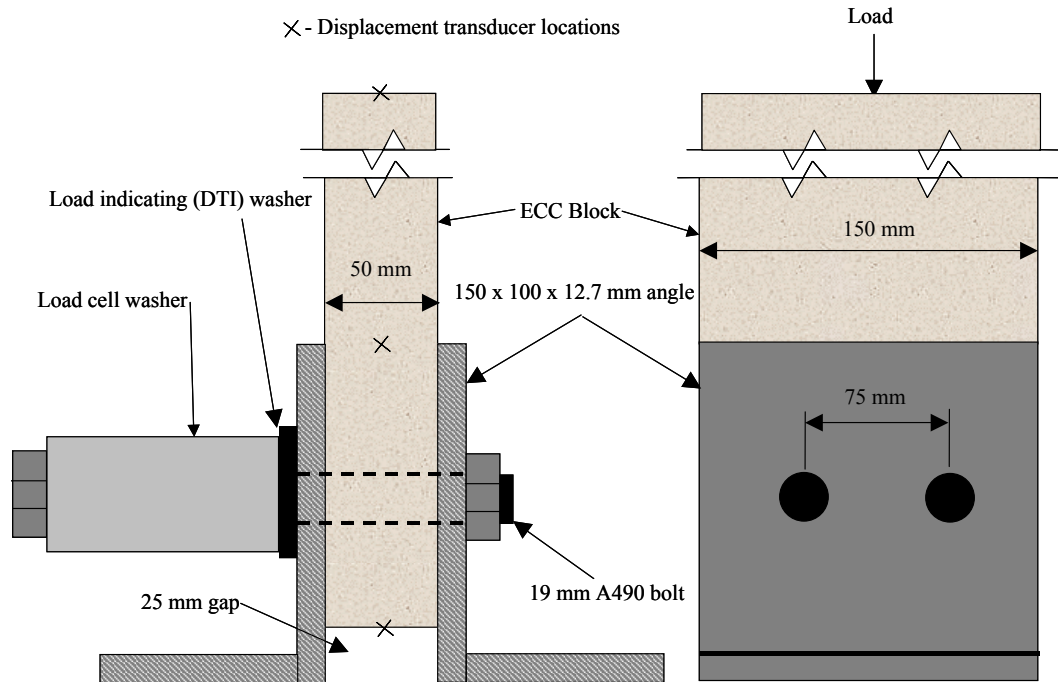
Connection test setup with load oriented perpendicular to axis of bolts
